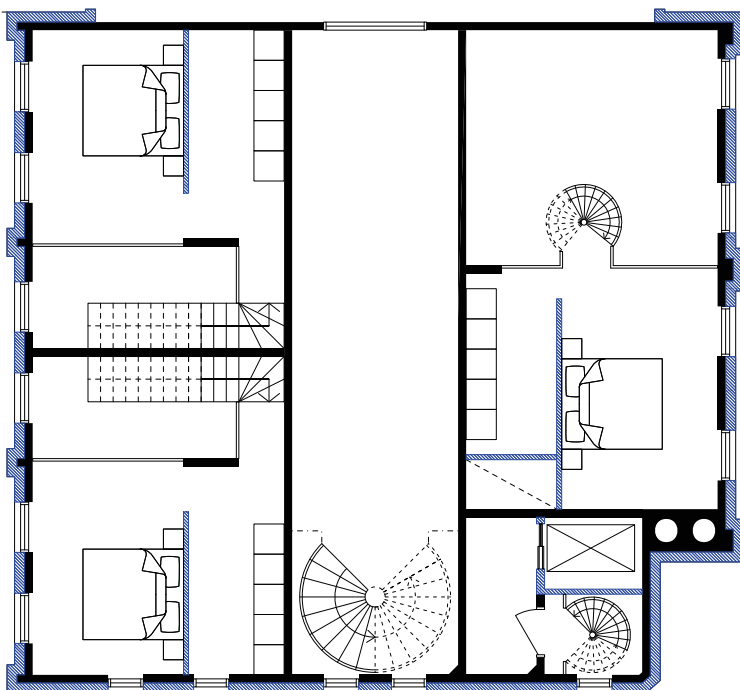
Floor plan 6 + 7 mezzanine, scale 1:150.
